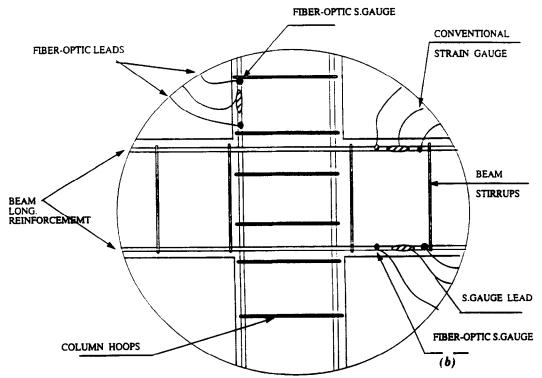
Reinforced concrete joint details and sensor locations (Masri et al.<sup>28</sup>).
